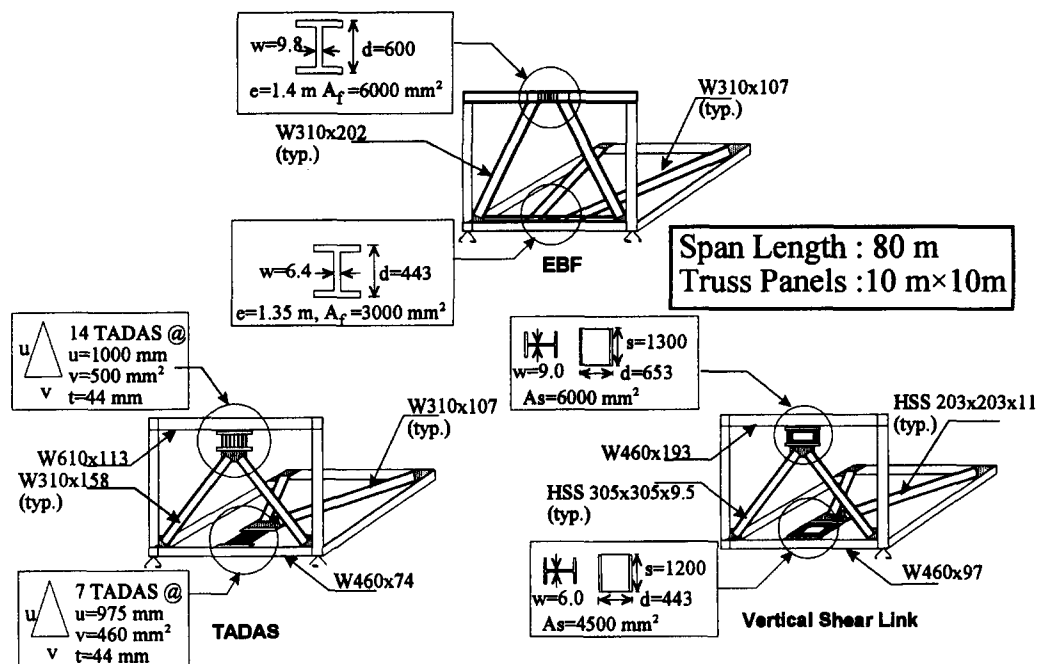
Details of Ductile Retrofit Design for EBF, VSL, and TADAS Systems for Example Deck-Truss Bridge
